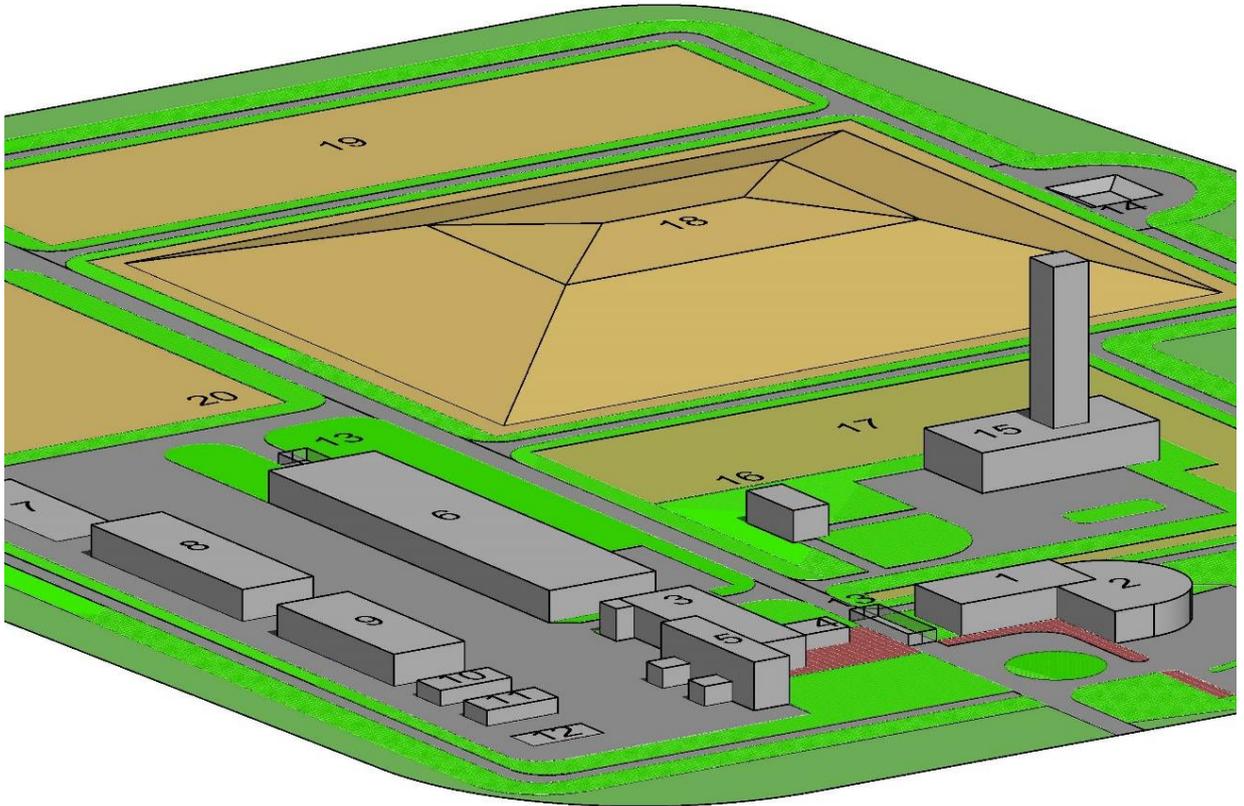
Four groups of buildings and surface areas of the National Facility. The first group on the background is formed by the landfill repository hill option (18) and related container laydown (19) and storage/construction area options (20). The second group includes the deep borehole area (15-17), and the third group includes the office building (1) and visitor centre (2) outside the facility fence. The fourth group is formed by the rest of the buildings related to the intermediate depth repository (and DGR) access routes and a shared storage/construction area, waste reception building, packaging, maintenance, research, security etc. Detailed index numbers and buildings are presented in Figure 5-5. Figure AINS.
